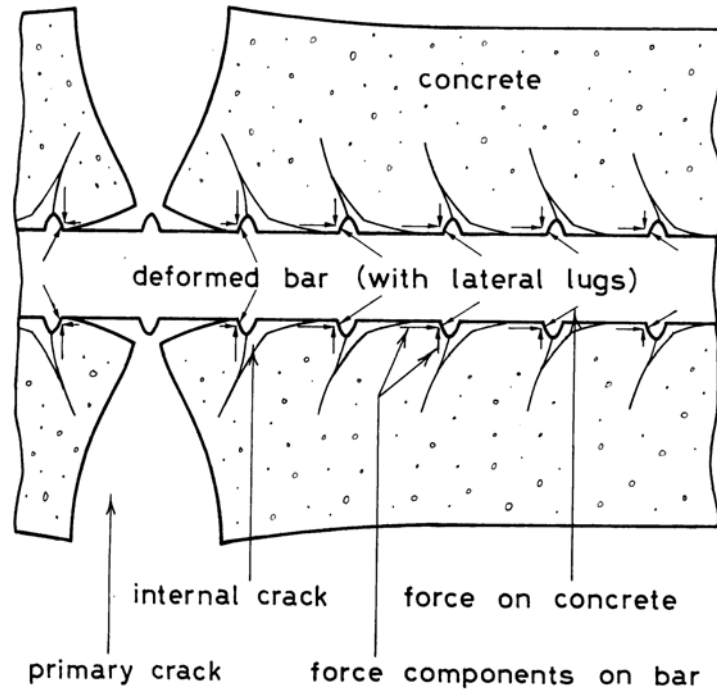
Idealized schematics of concrete deformation around reinforcement under tensile loading from [Goto, 1971].
